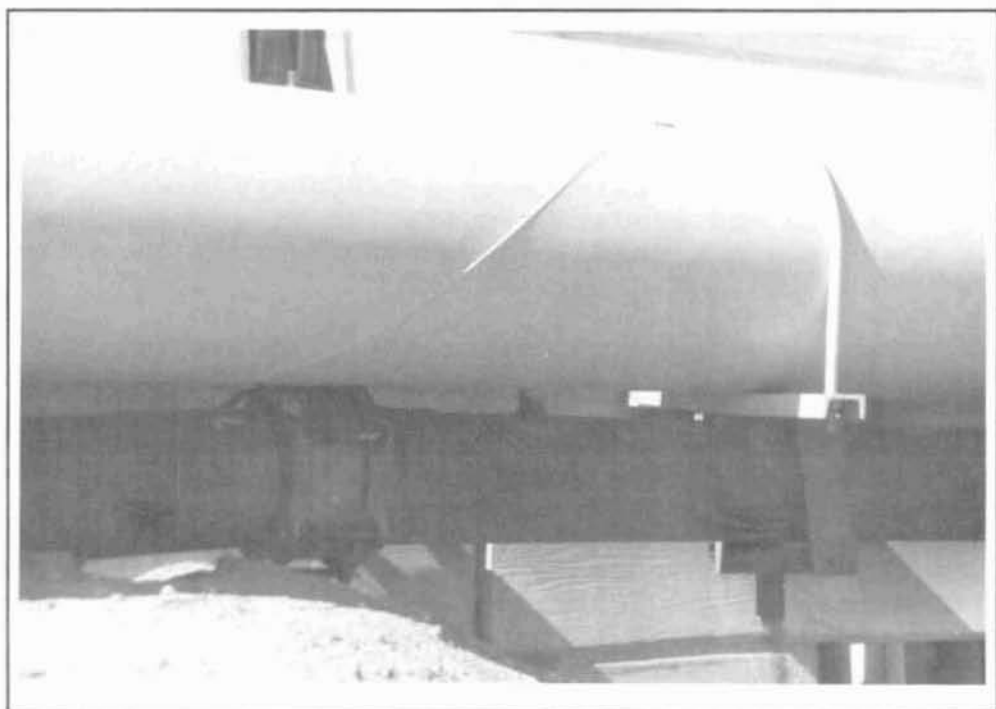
Fiber Optic Conduits Under a Heavy Water Pipe, Both On A Highway Bridge
